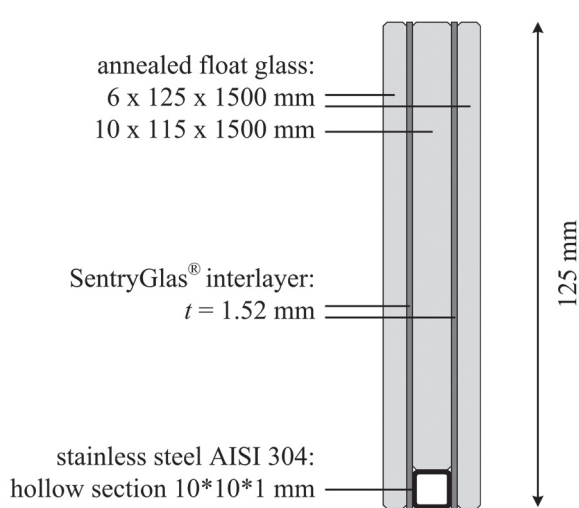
Cross-section of the SG-laminated reinforced glass beam specimens.
